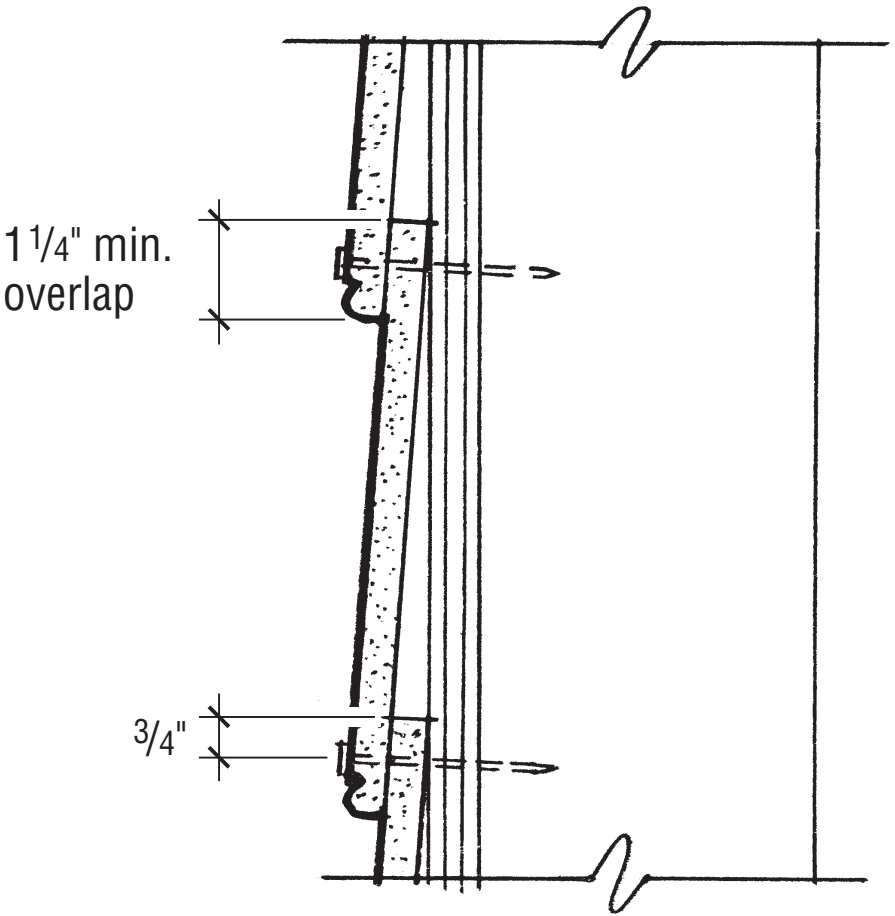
FIGURE: FACE NAILING FIBER-CEMENT SIDING
